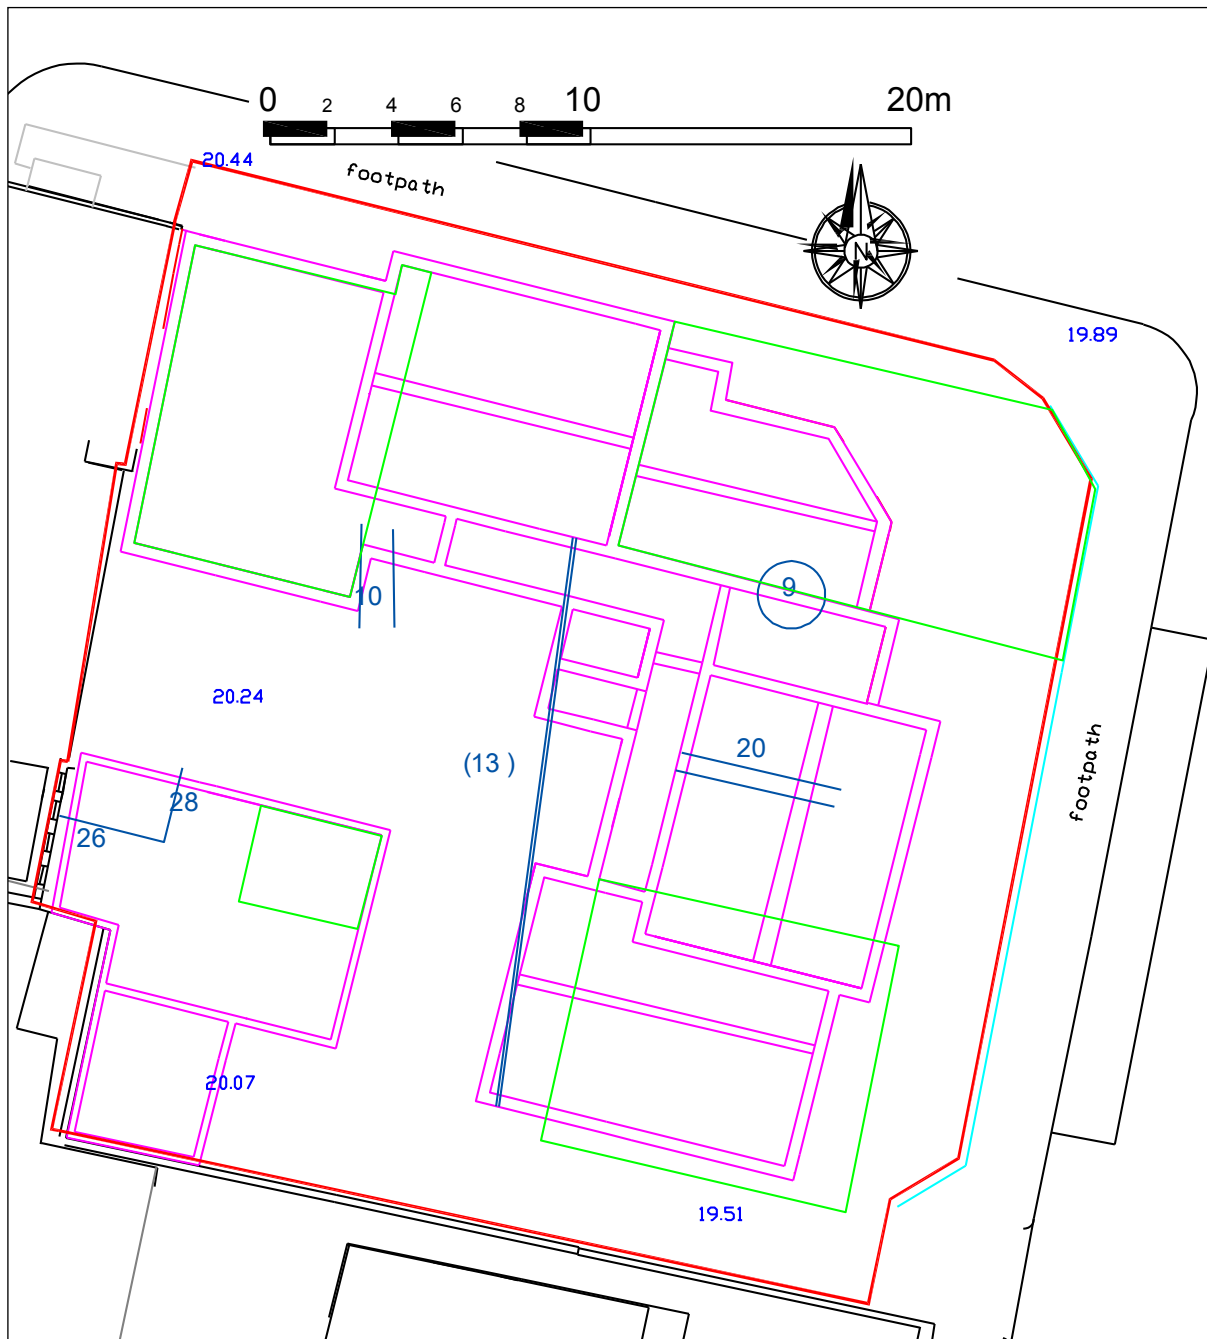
Plan of features as exposed by excavation of the foundations. Green outlined areas are modern disturbances. Heights are metres above Ordnance Datum prior to construction.
